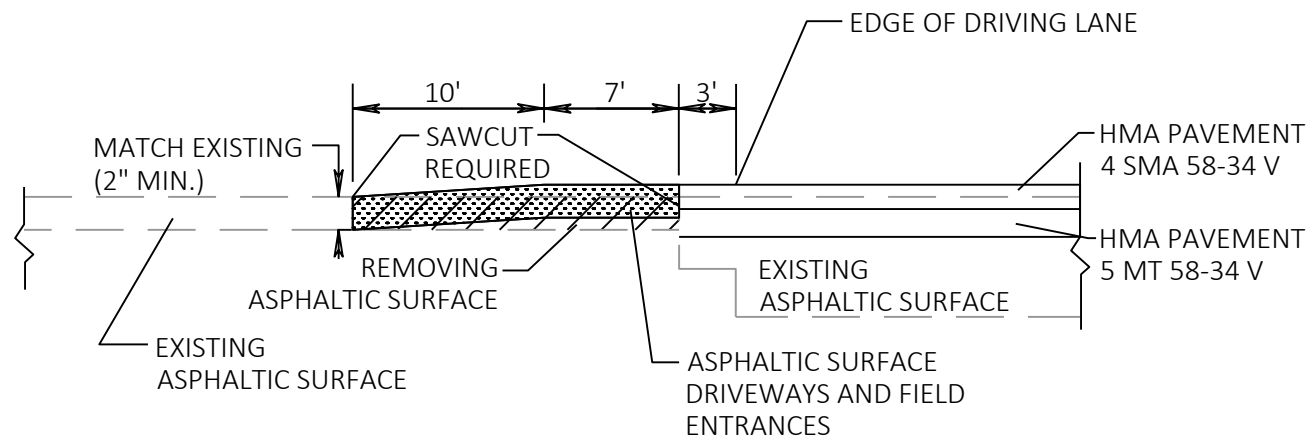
DETAIL FOR MAINLINE CONSTRUCTION JOINT
